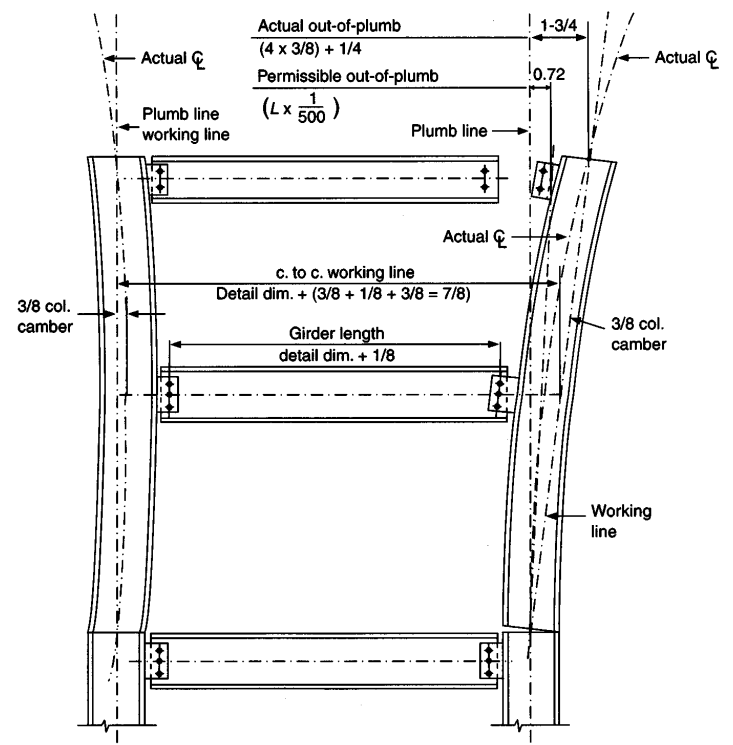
Possible (but unlikely) accumulation of tolerances when details are located from actual centerlines.
